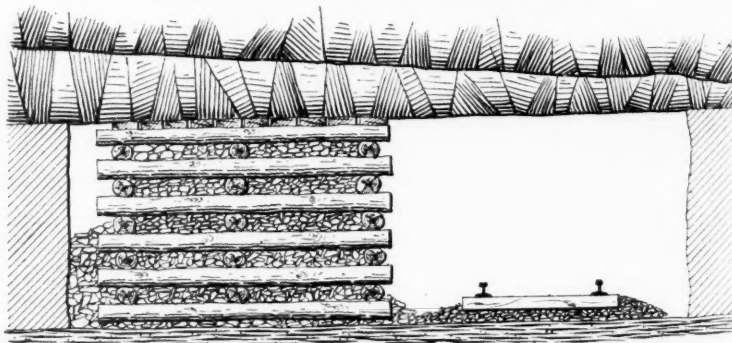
TIMBER GRIB SUPPORTING LOOSE ROCK
